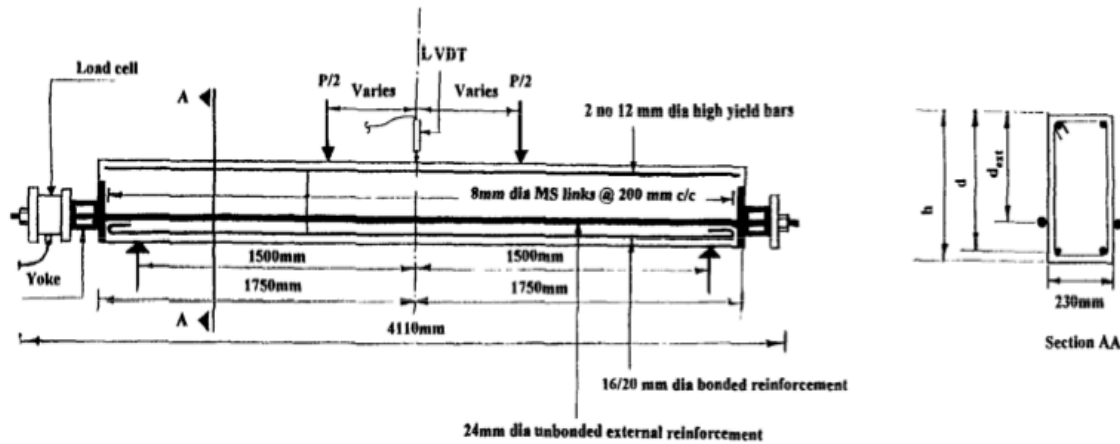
4- Details of test specimens (Cairns et al. 1997).
